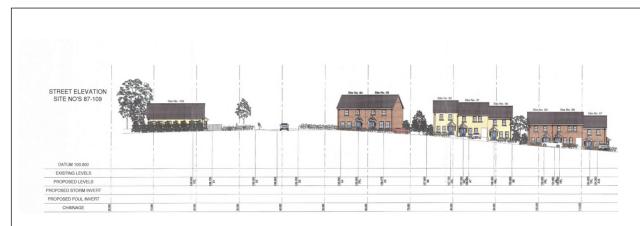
Street Section of approved single storey dwelling under LA09/2020/0537/F.
